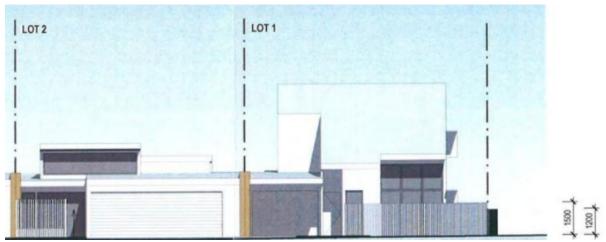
Extract from stamped plans – Sunfish Lane frontage
